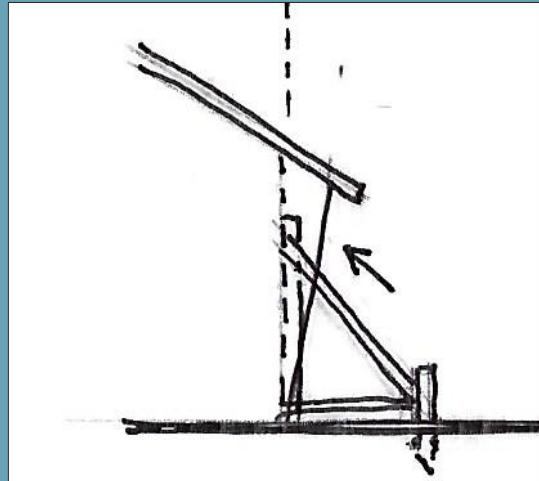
Leaning buildings should be temporarily propped up until a more thorough solution can be found.
